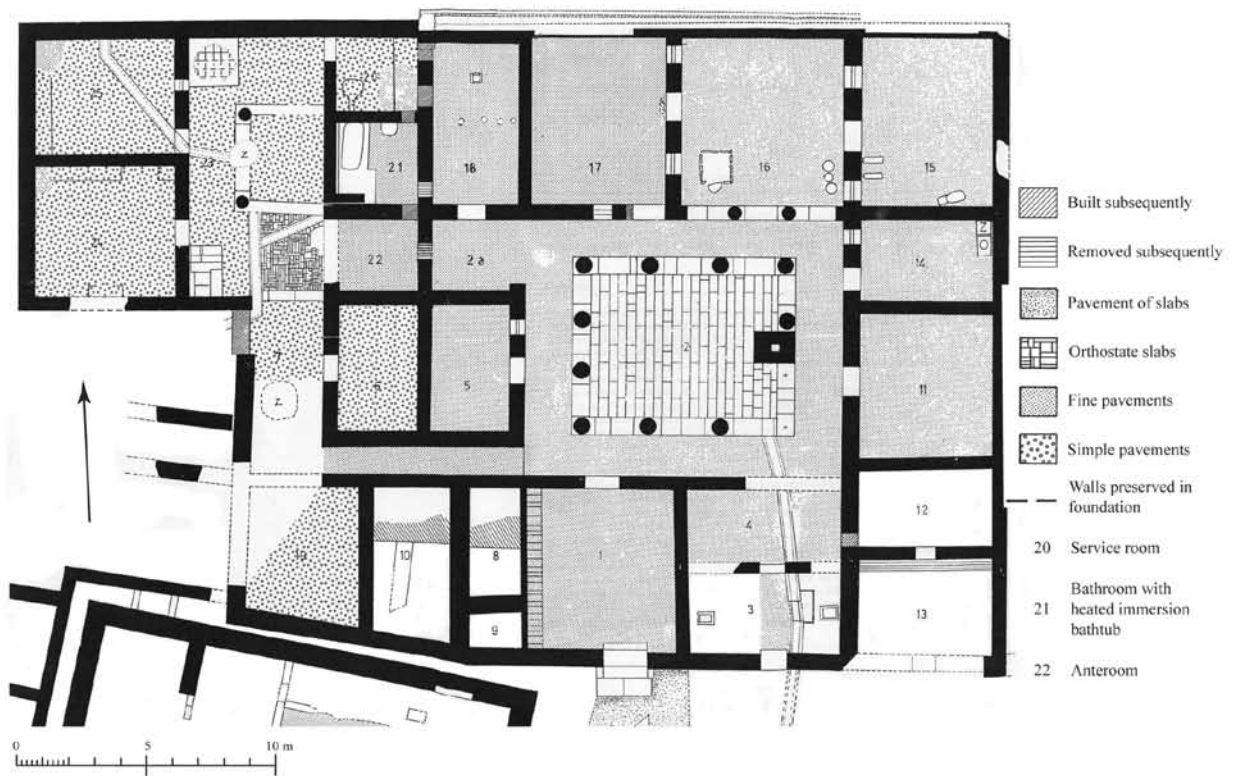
Monte Iato, Peristyle house 1: plan of the building after the enlargement around c. 200 BC
